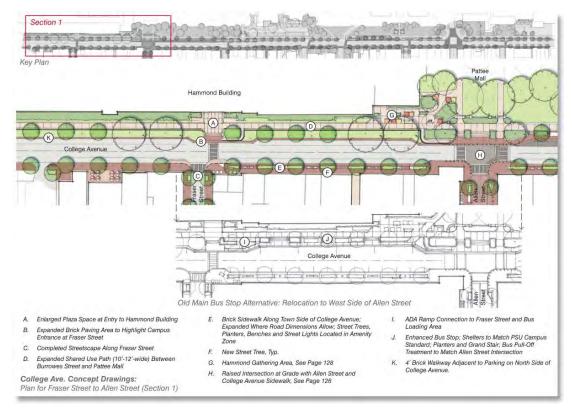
College Avenue Streetscape, Allen Street through Fraser Street 32
